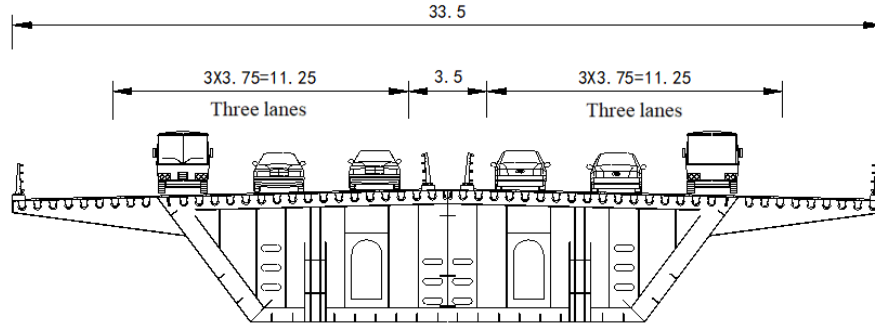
Cross section configuration of the non-navigable bridge in this study (unit: cm)
